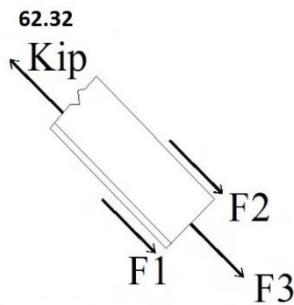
weld between diagonal member and gusset plate
